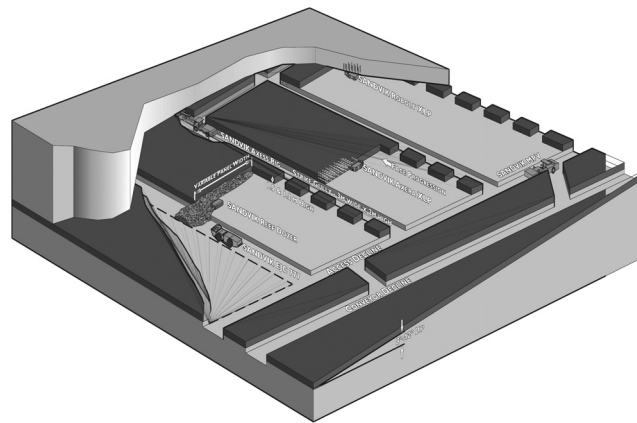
Typical XLP breast mining layout with XLP and LP equipment
